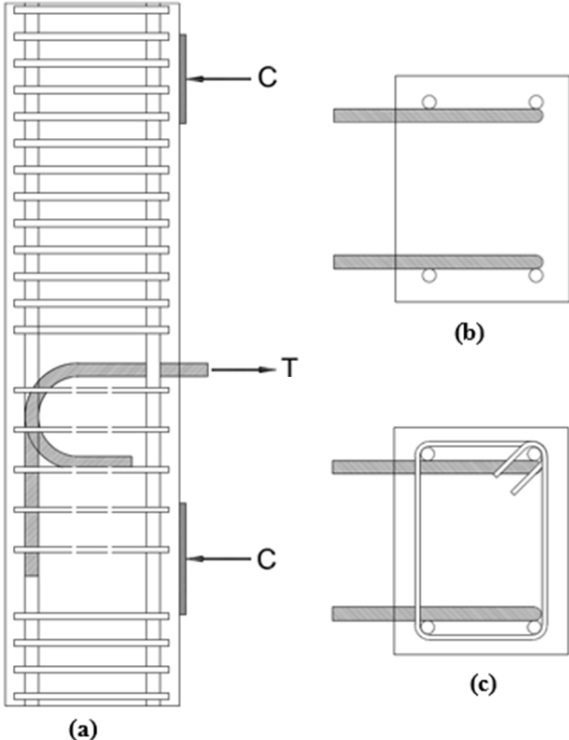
Schematic of specimens (a) side view of specimen (b) cross-section of specimen with hooks inside column core and without confining transverse reinforcement (c) cross-section of specimen with hooks inside column core and with confining reinforcement
